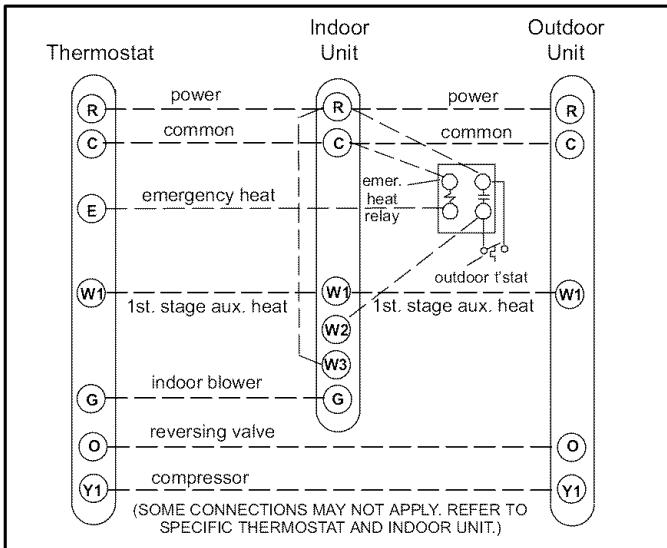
13HPX Outdoor Unit Typical Wiring Diagram
